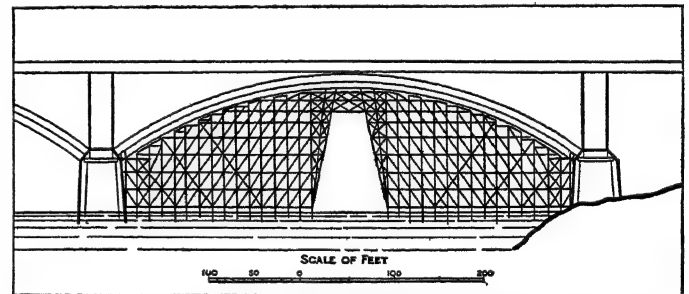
TEMPORARY STAGING, WASHINGTON BRIDGE, NEW YORK
